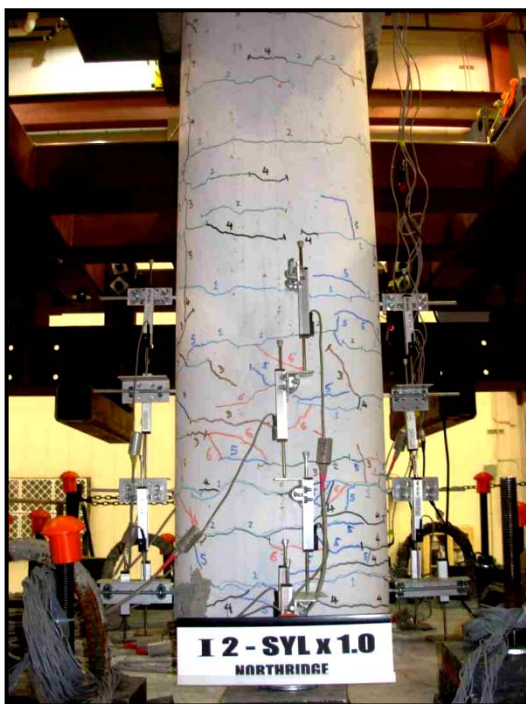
First Concrete Spalling Specimens I2 (SYLx1.0)
